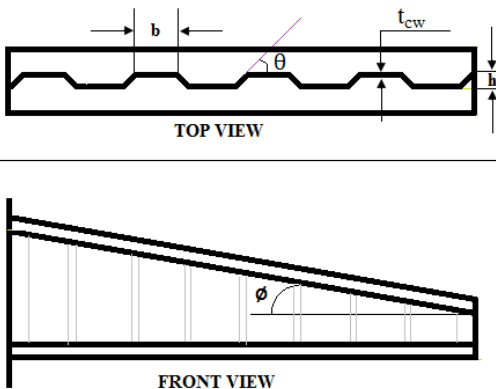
Proposes varying cross section cantilever beam with trapezoidal web
